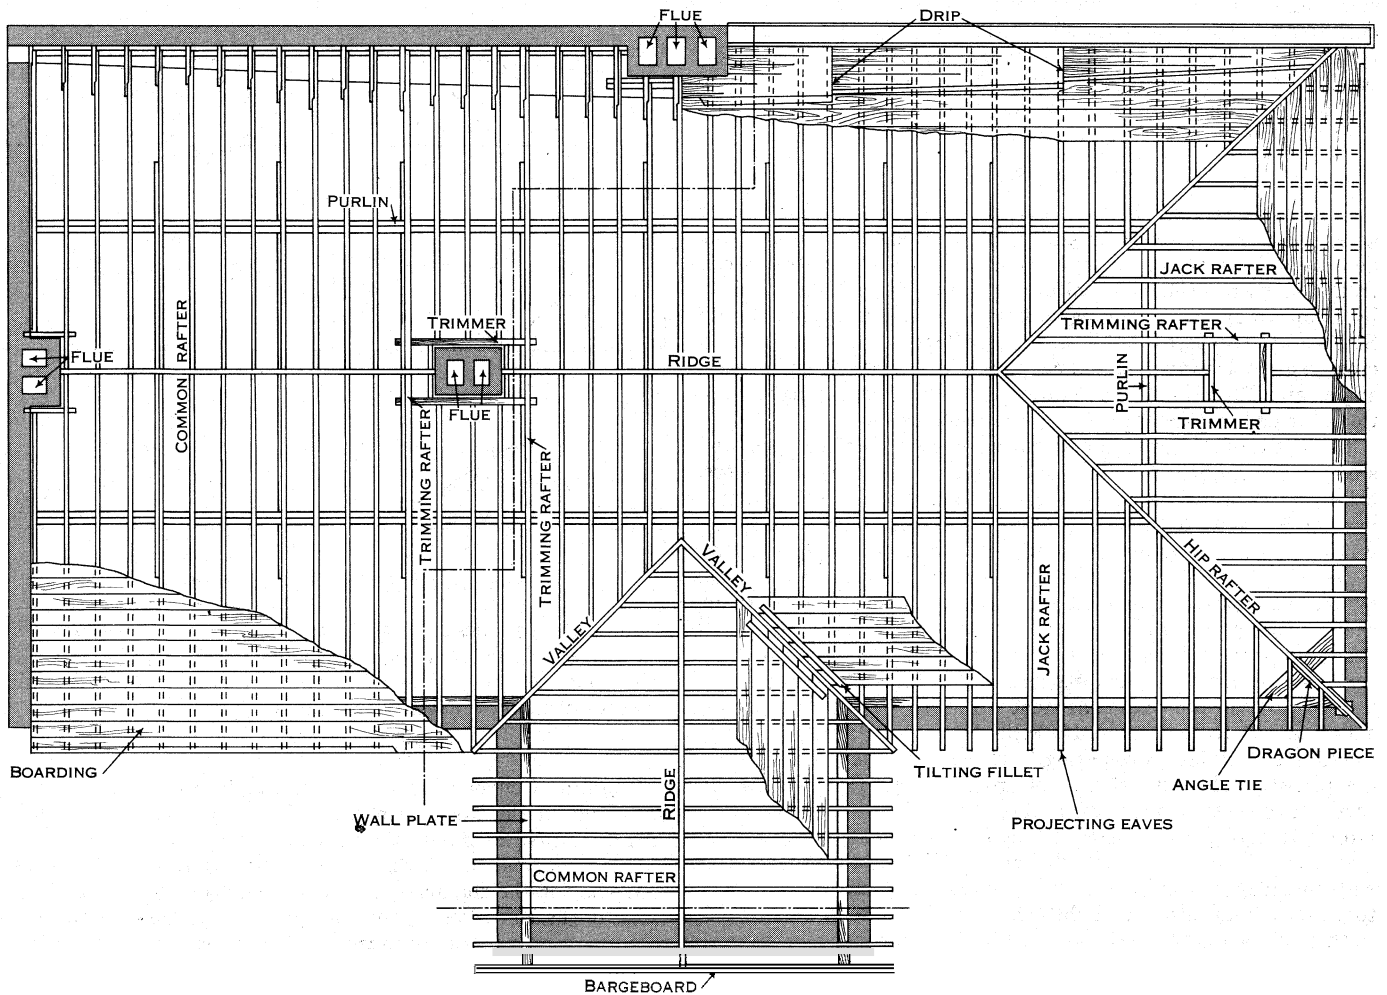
PLAN OF A ROOF SHOWING THE DETAILS OF CONSTRUCTION
